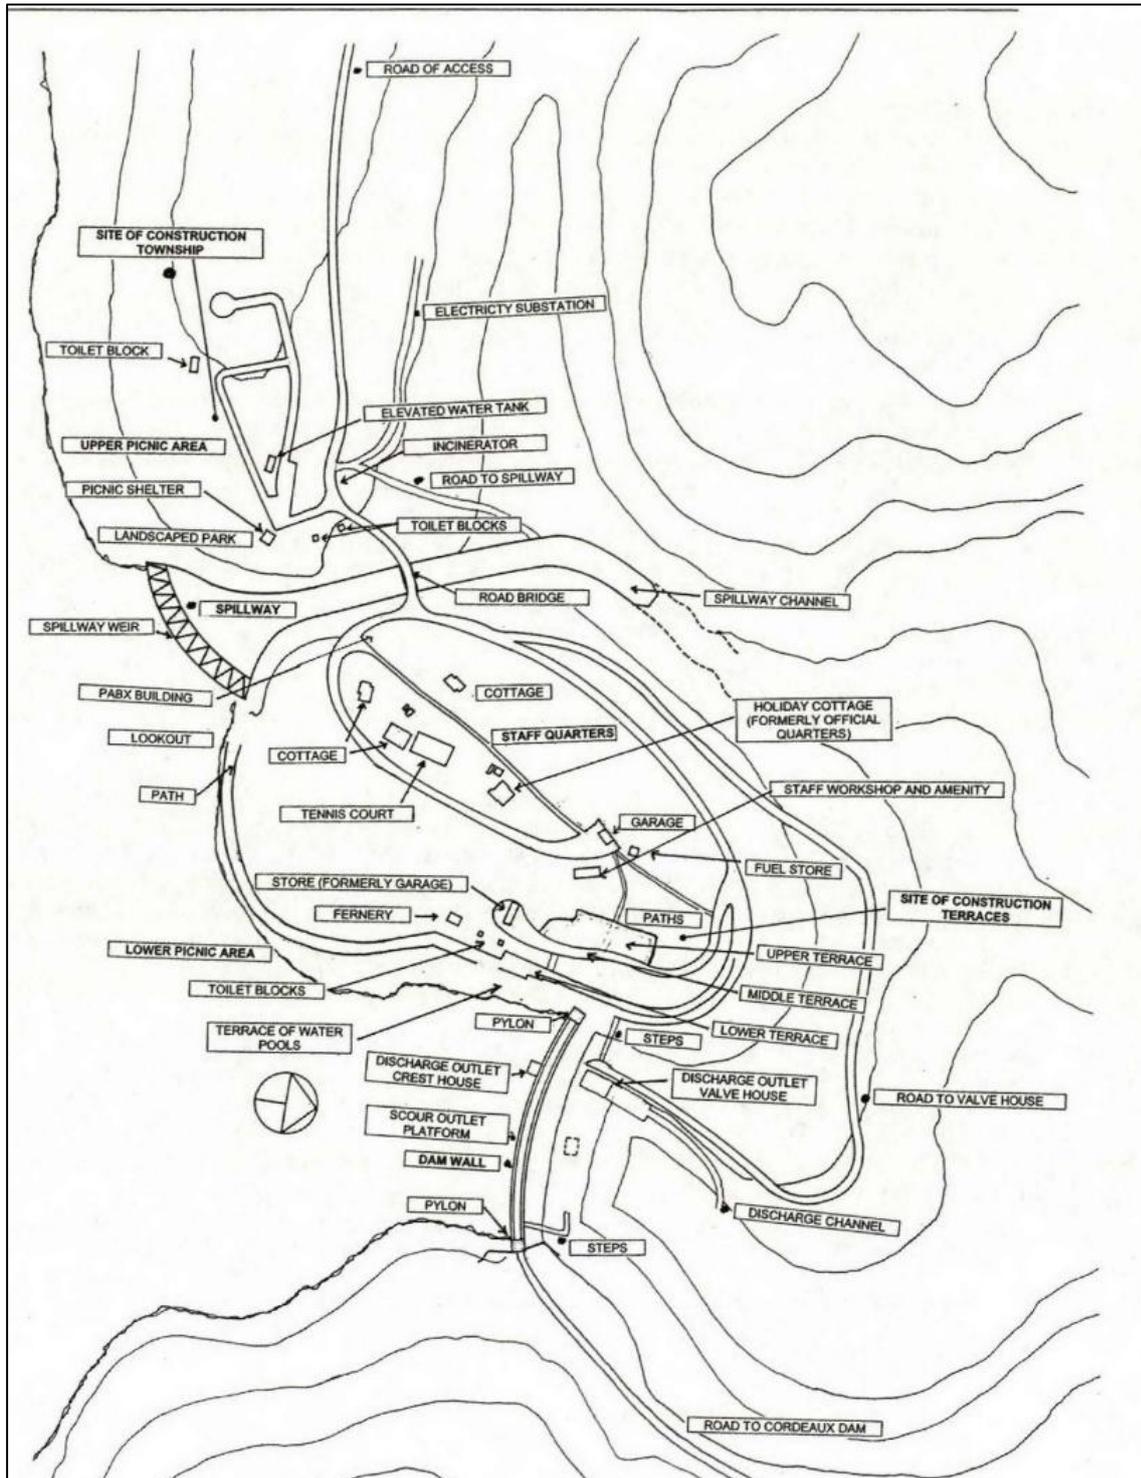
Avon Dam site plan (Source: Sydney Catchment Authority Metropolitan Dams Conservation Management Plan 2003)
